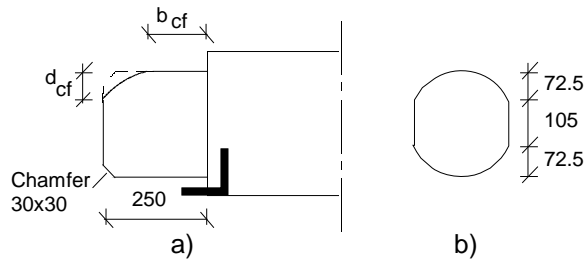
a) Core filling seen in the beams's direction. b) Nominal dimensions of a hollow core.
